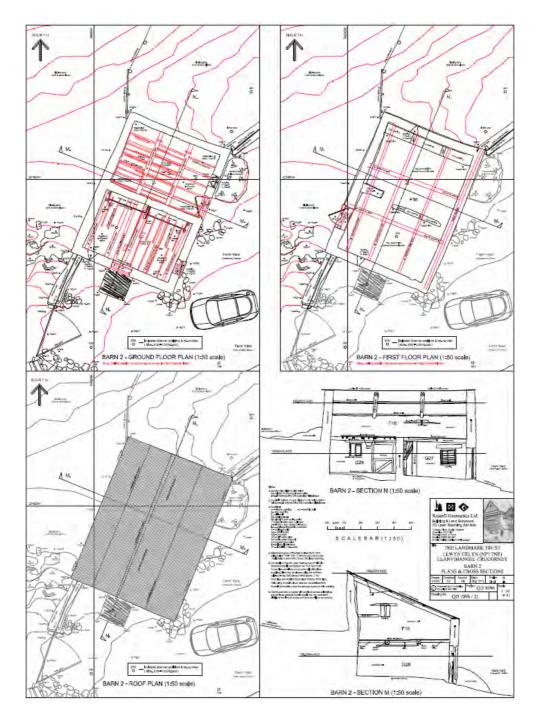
Plans and cross-section of the Stable (Building E; Barn 2).
